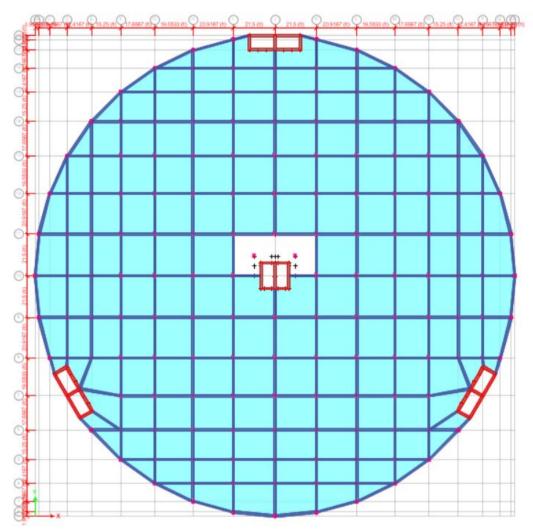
(e): 1st Floor Plan View of Non-Braced Structure
